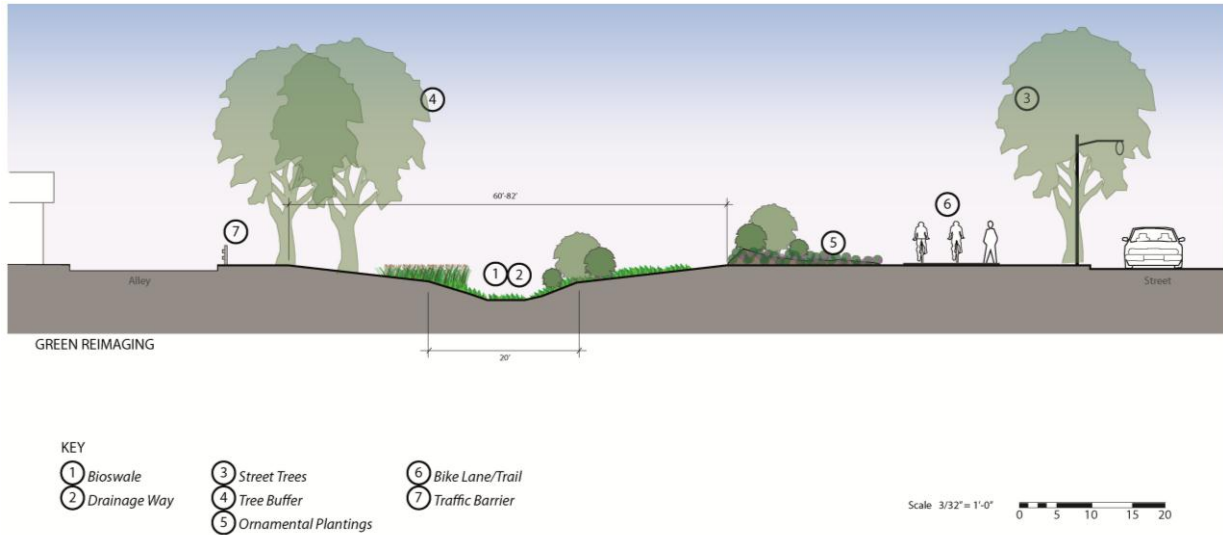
Conceptual Greenway Corridor Cross Section View on N. 27th Street from W. Clark Street to W. Meinecke Avenue
